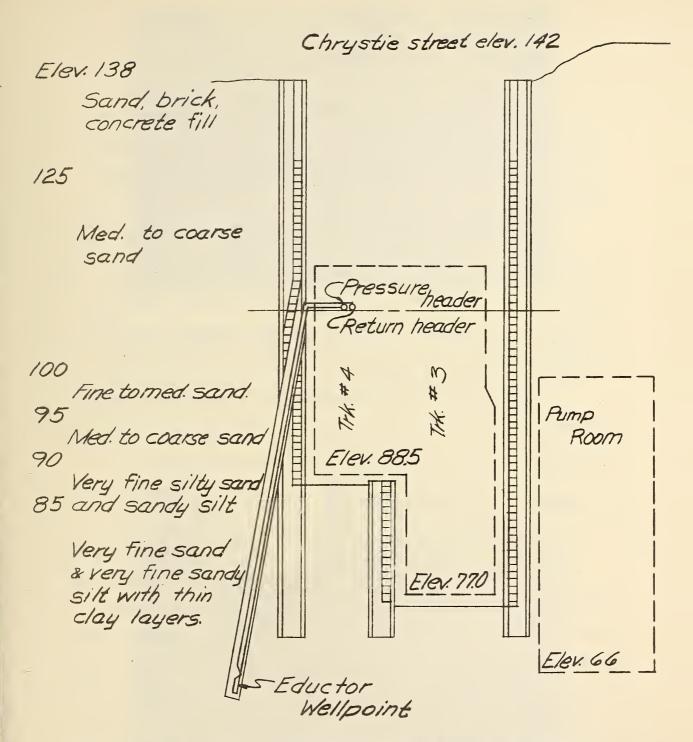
INSTALLATION OF JET-EDUCTOR SYSTEM WITHIN AN EXCAVATION. (Engineering News-Record, October 1, 1959, p. 34, by permission.)
